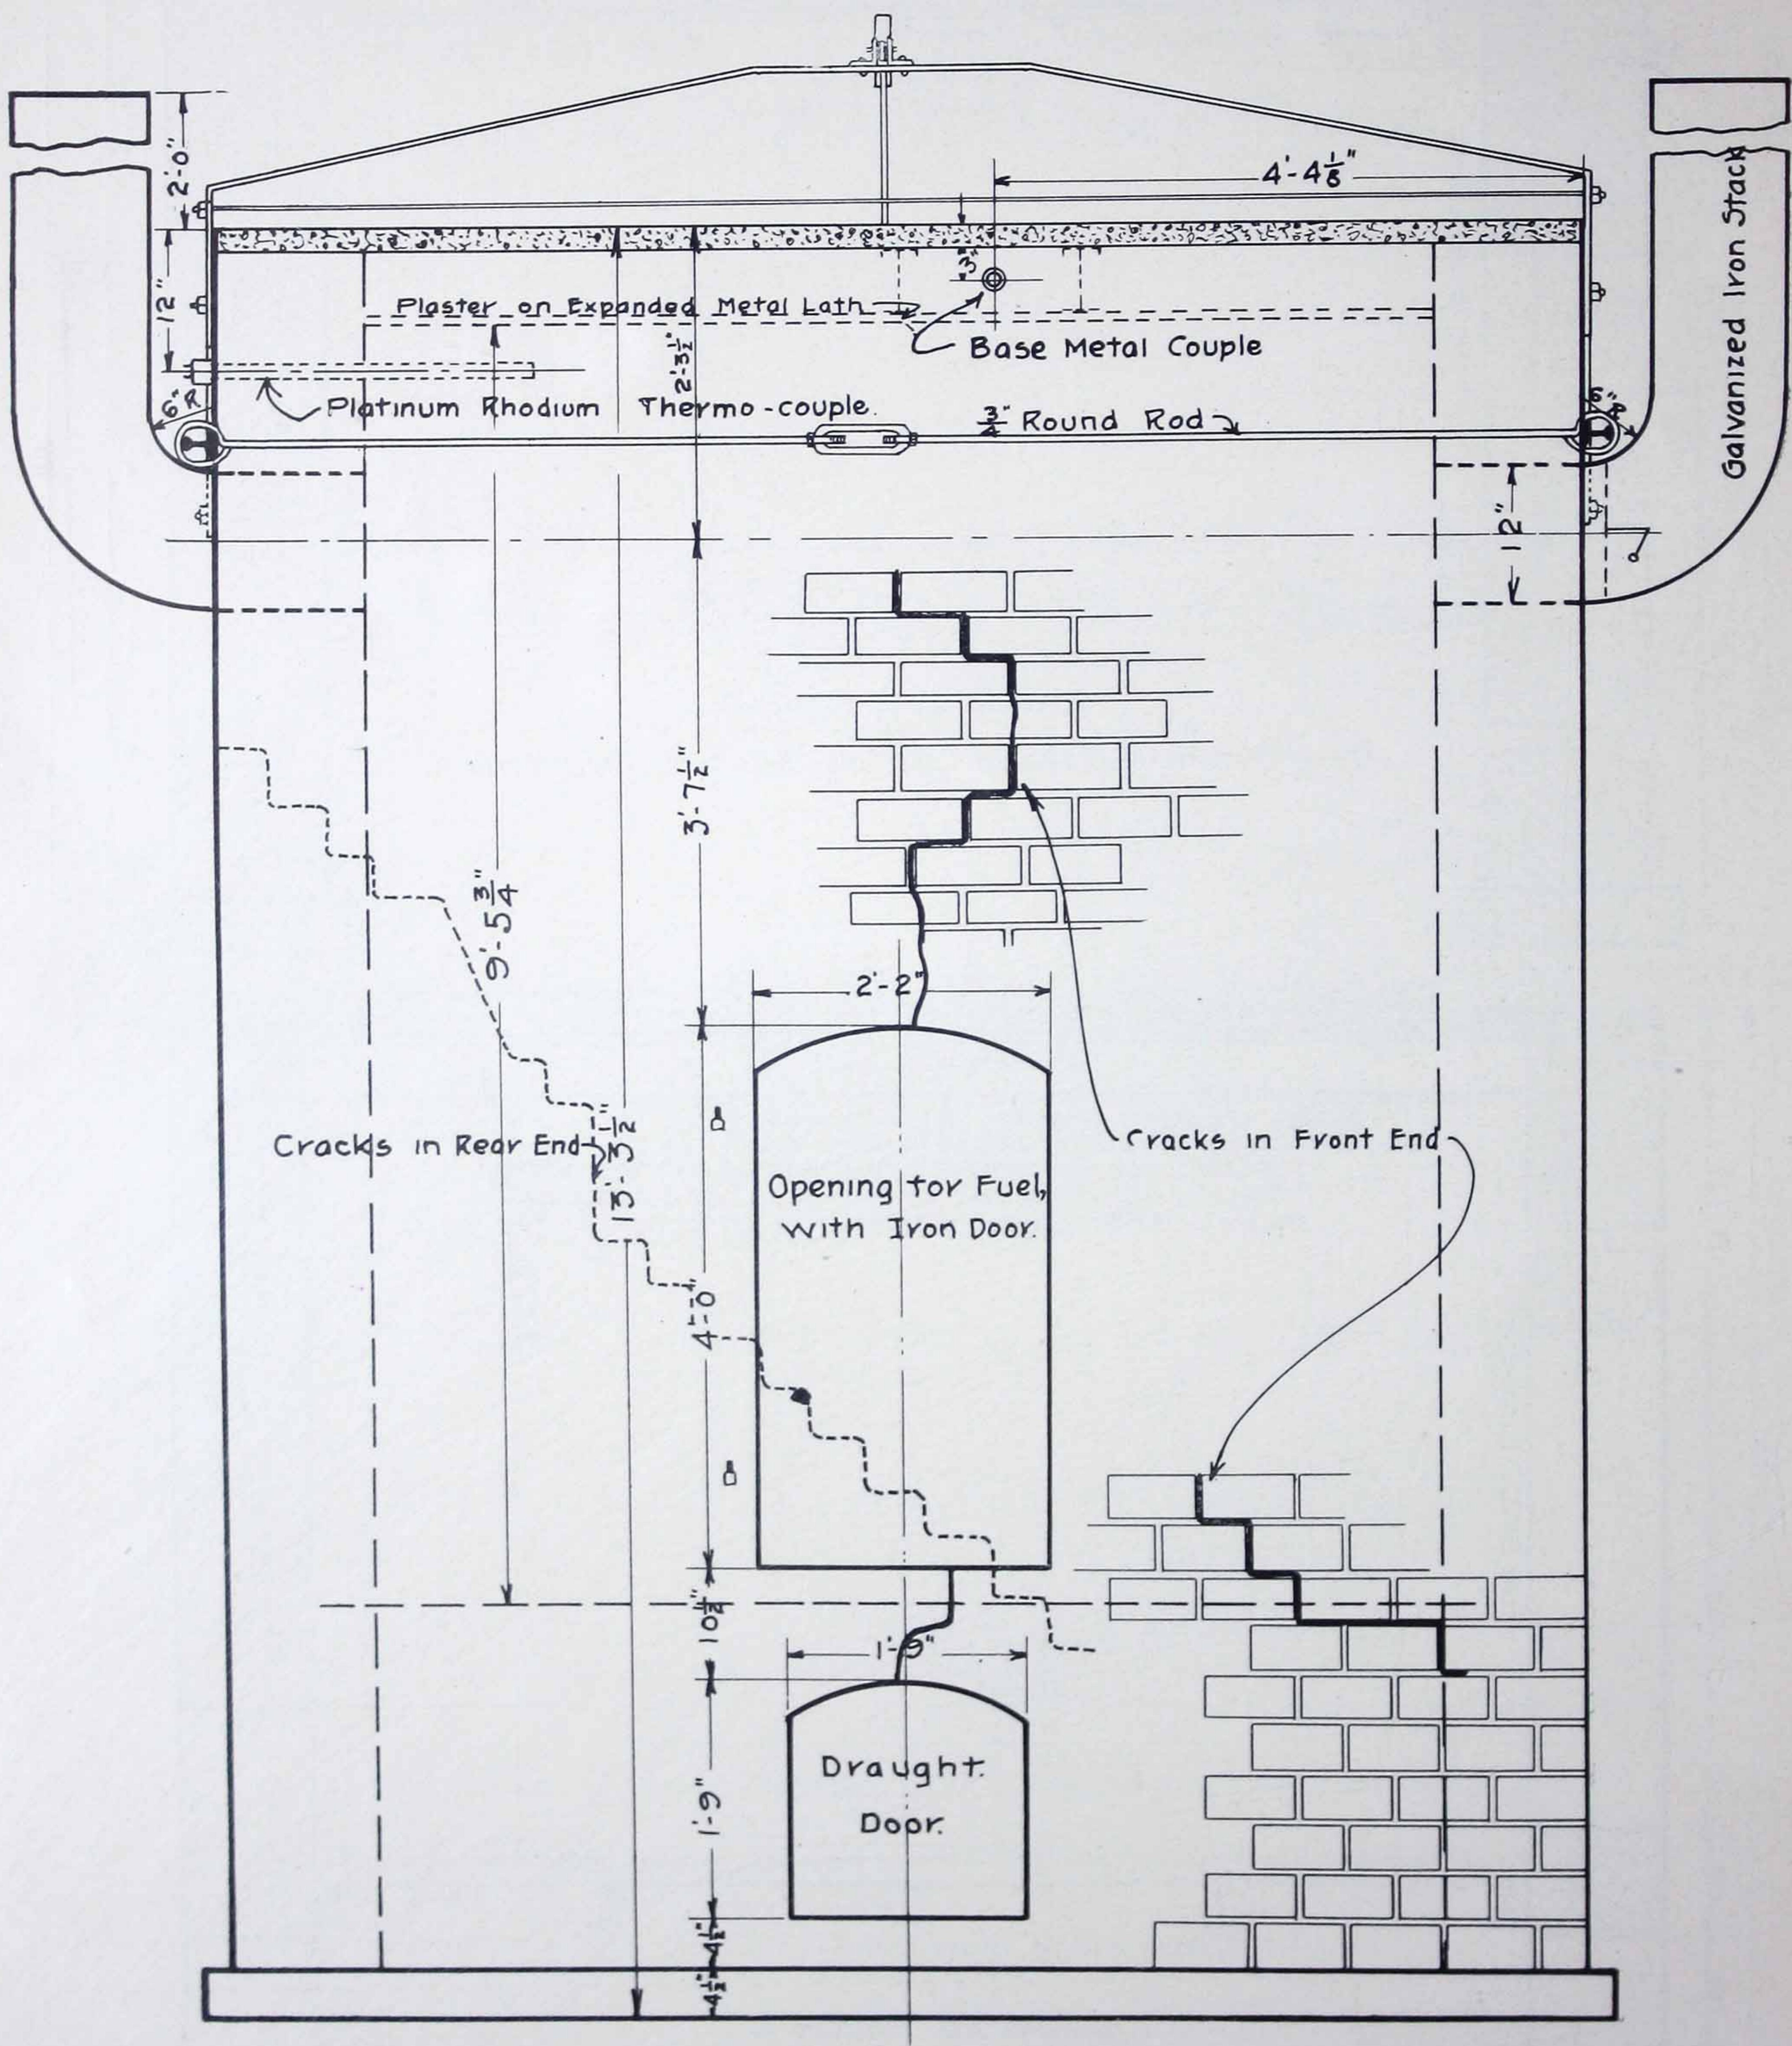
Front Elevation of Furnace Showing Condition of Walls After Test.
